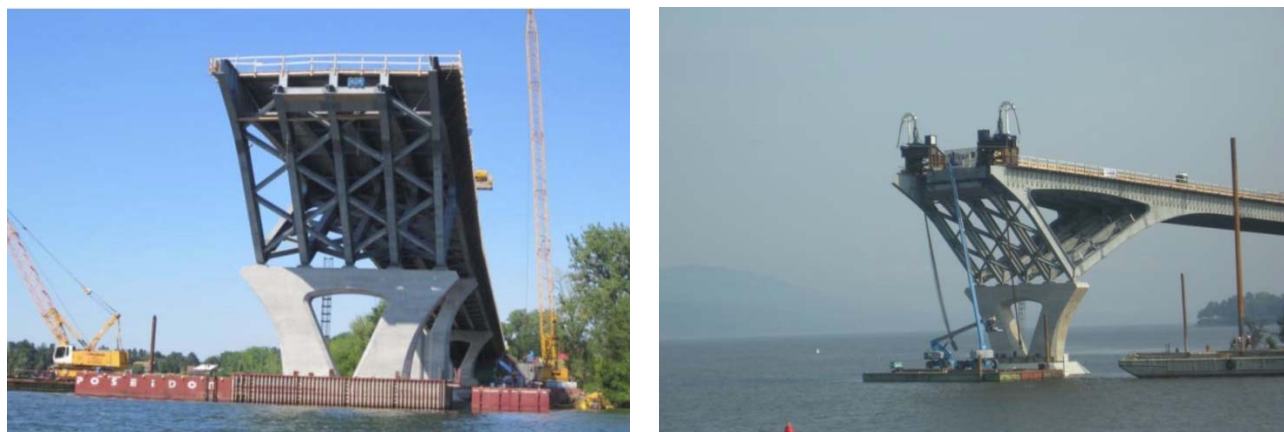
Steel V-Piers (Champlain Bridge)
